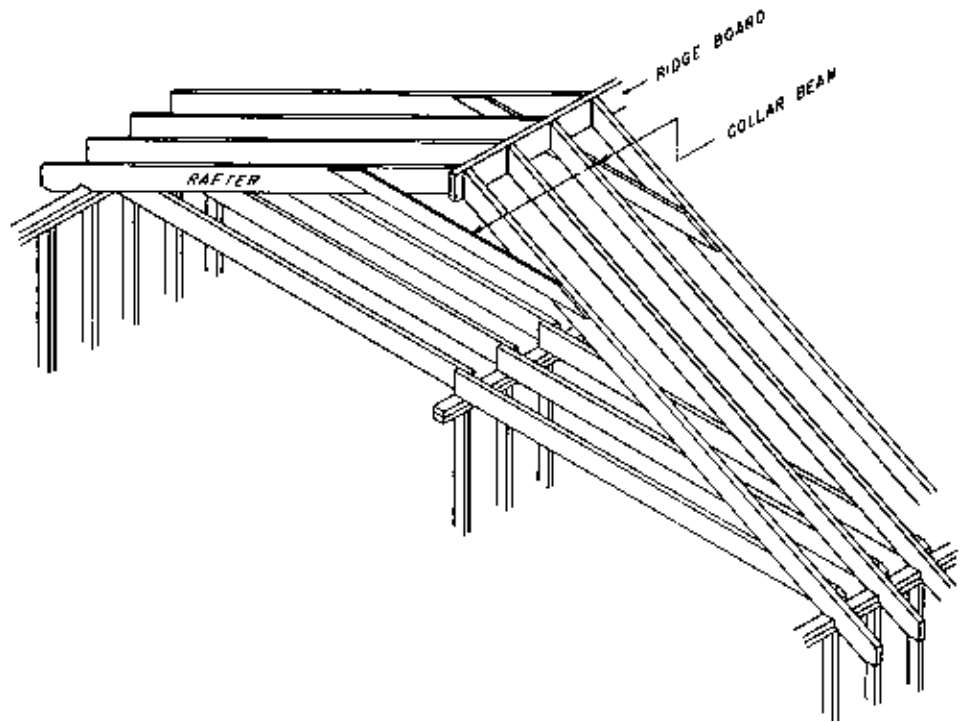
Roof framed with rafters and ceiling joists. (Courtesy of American Forest and Paper Association)
